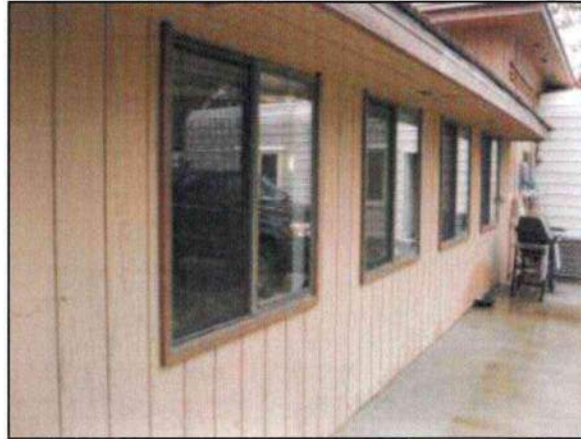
Fire Station #4 A general view of the rear of the fire station showing the aluminum window frames with insulated glass.
